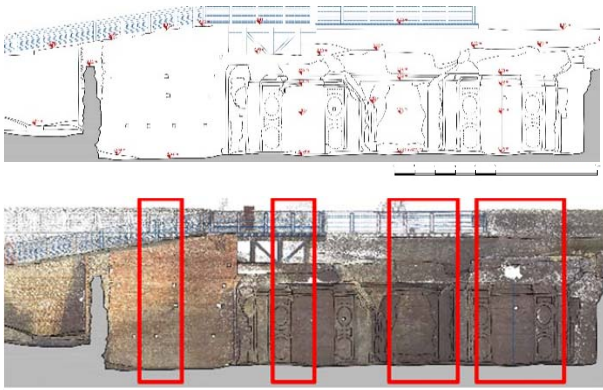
The digitalization of section G-G' from LiDAR data and the 4 samples for analysis: (a) masonry wall; (b) pilaster with niches, mixed stones-bricks walls; (c) central apse part, mixed stones-bricks walls; (d) lateral apse and walls ridges.
